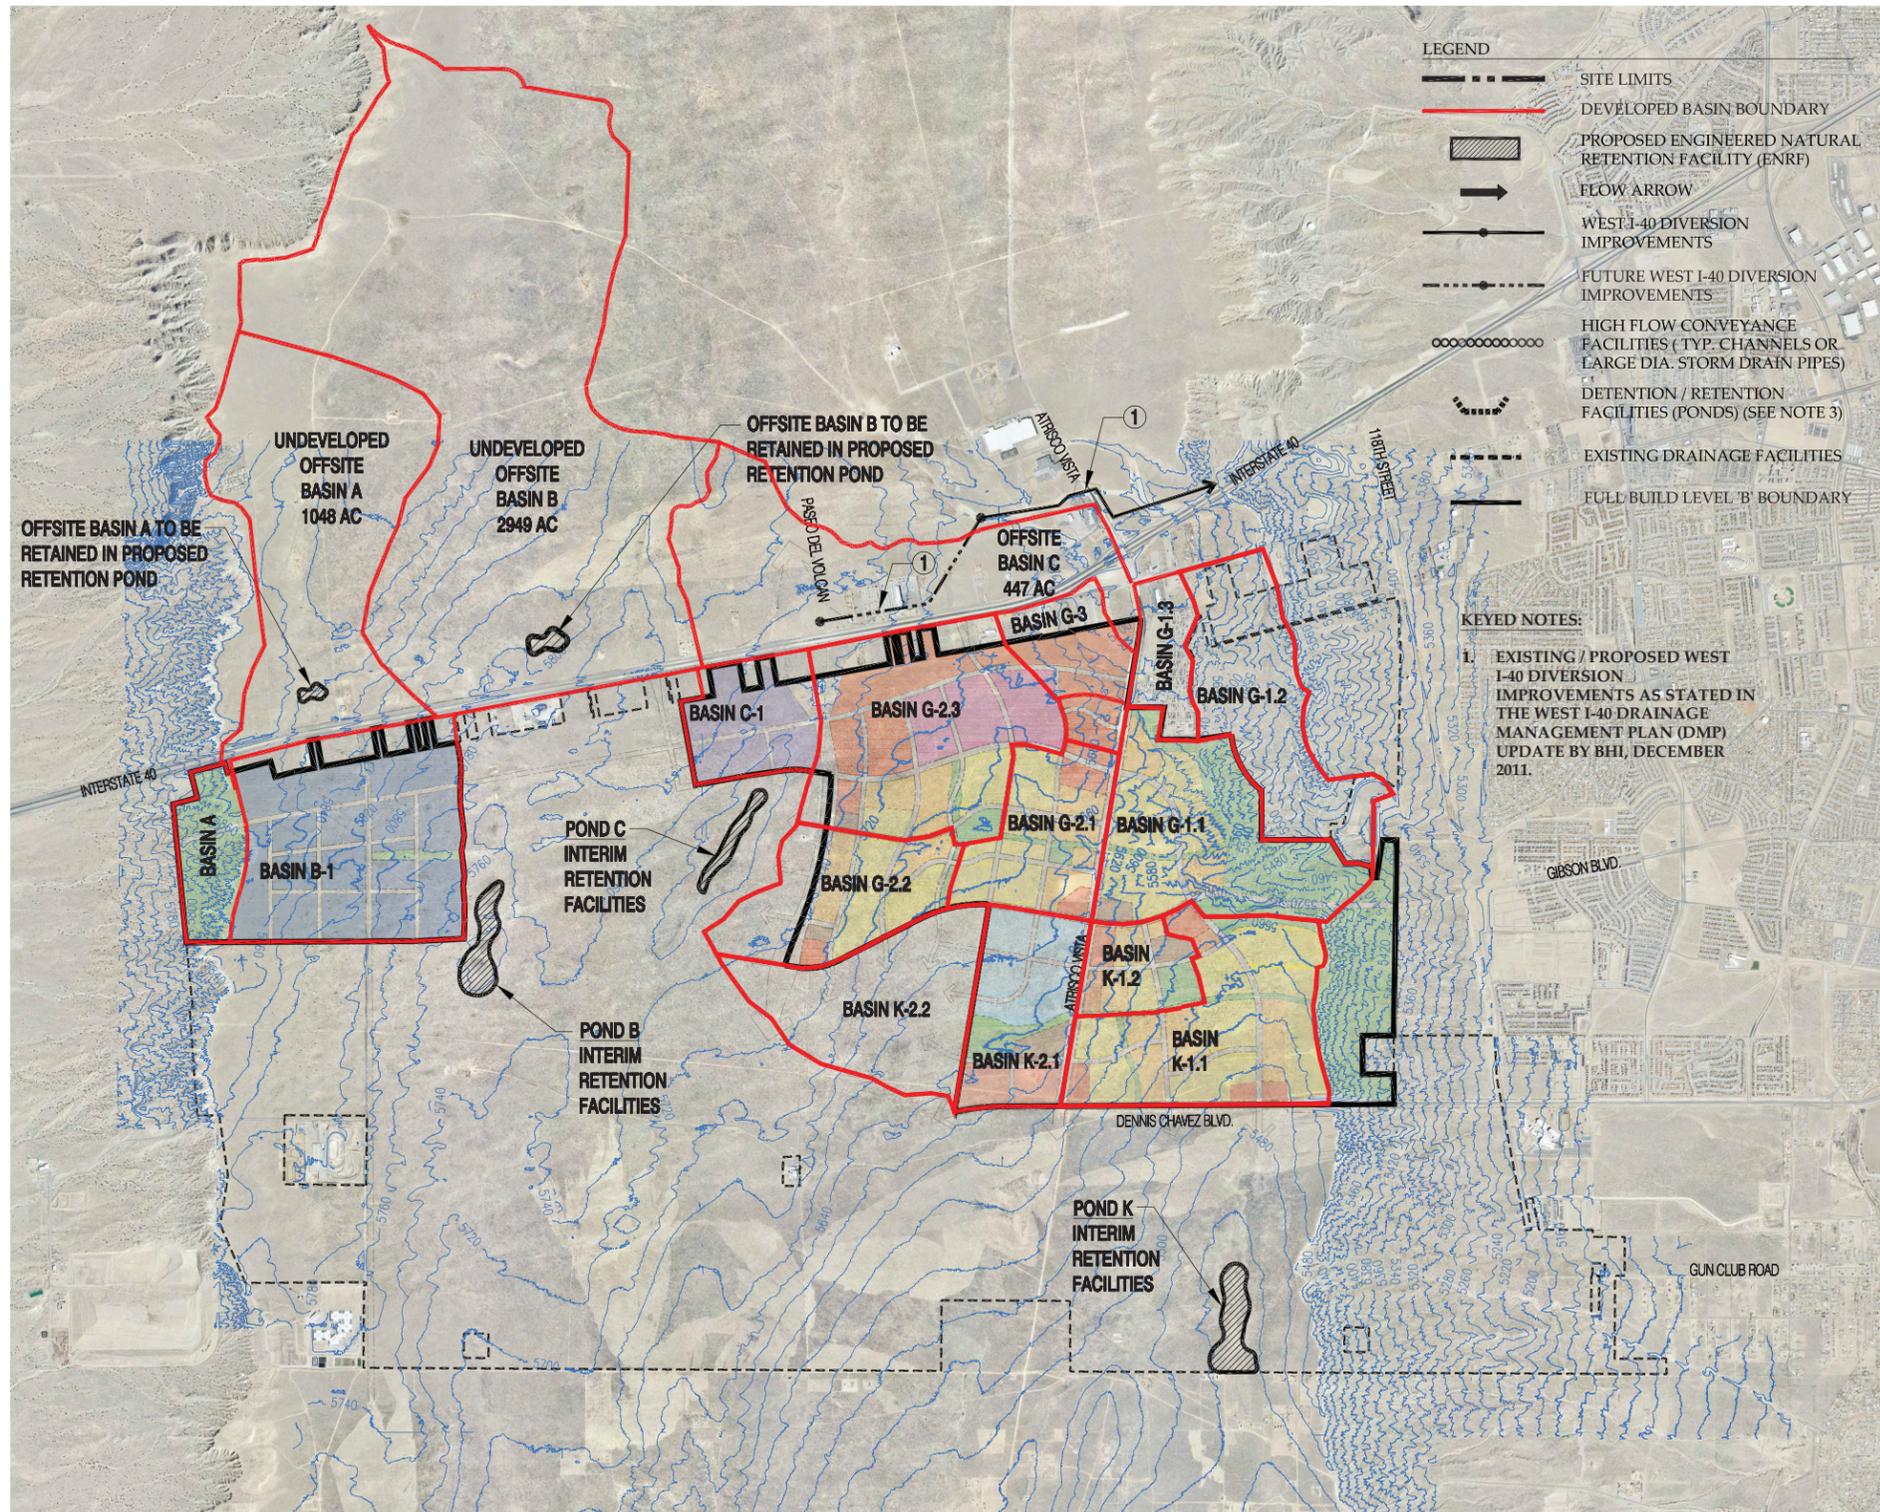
STORMWATER MASTER PLAN, 2025
